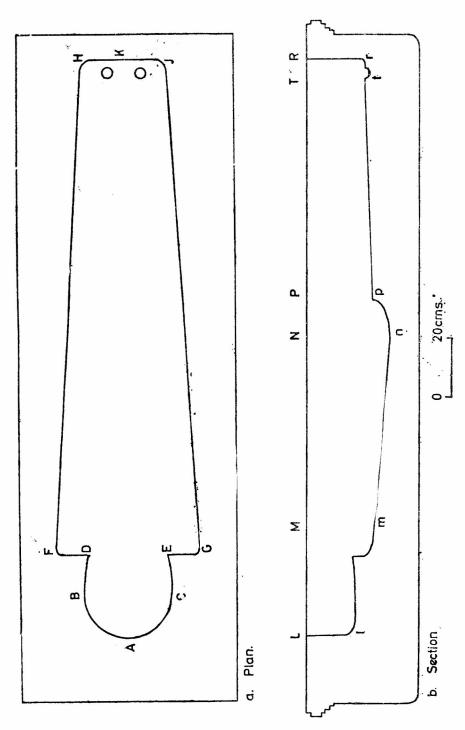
Plan and section of the immersion bath at the Thuparama.
